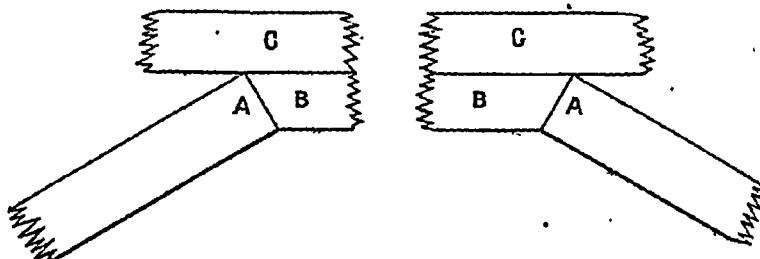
is the elevation of a mitre joint. A A are struts, B B the straining beam, and C C part of the longitudinal beam.
